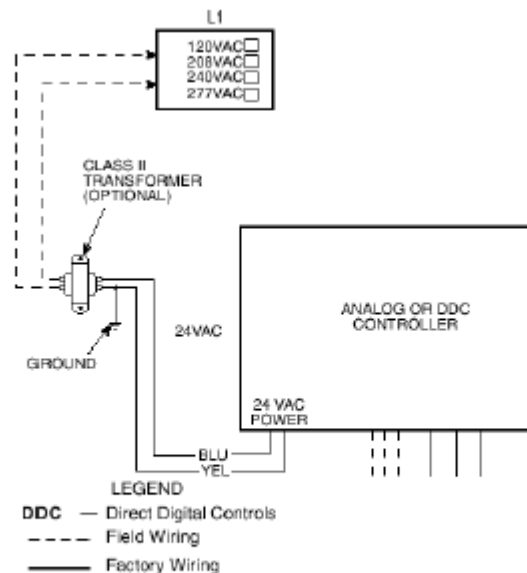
Wiring of Optional Factory-Mounted Transformer
